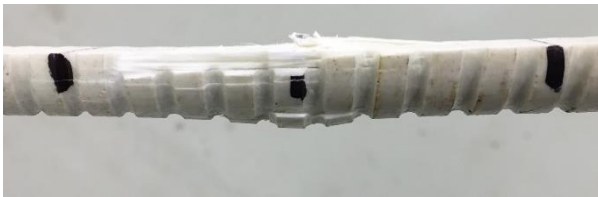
Close-up View of Side Face of M13 Specimen Subjected to 4-Point Bending
